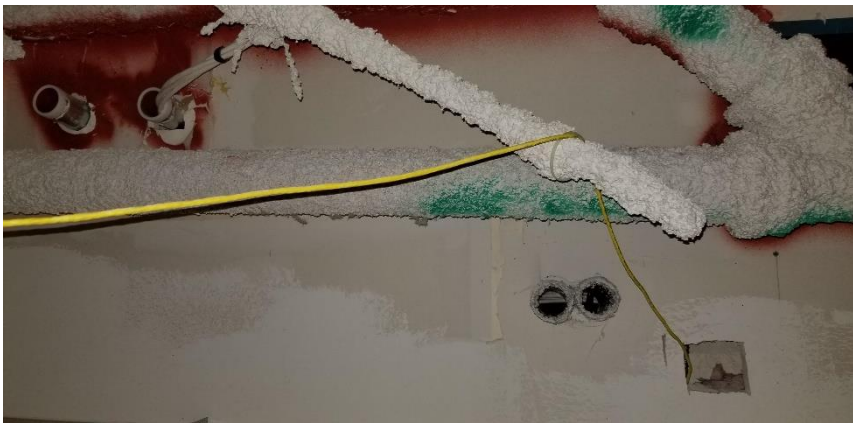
View of asbestos-containing wall plaster observed to be in poor condition in Room 1070.
